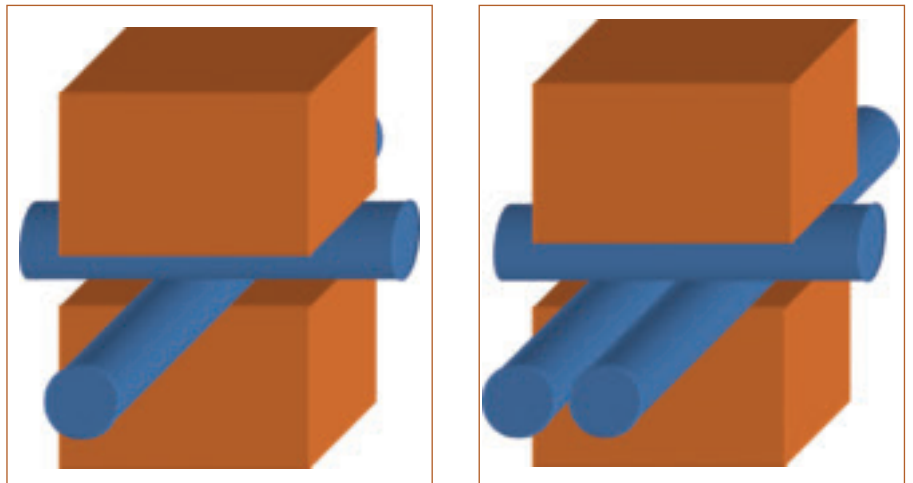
'Single' and 'double knot' cross wire welds.
